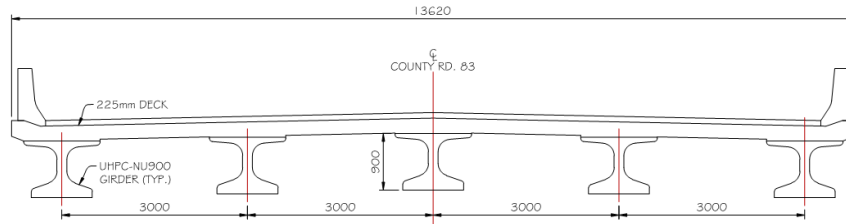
Cross-section of Huron County Road 38 Bridge: UHPC Alternative
